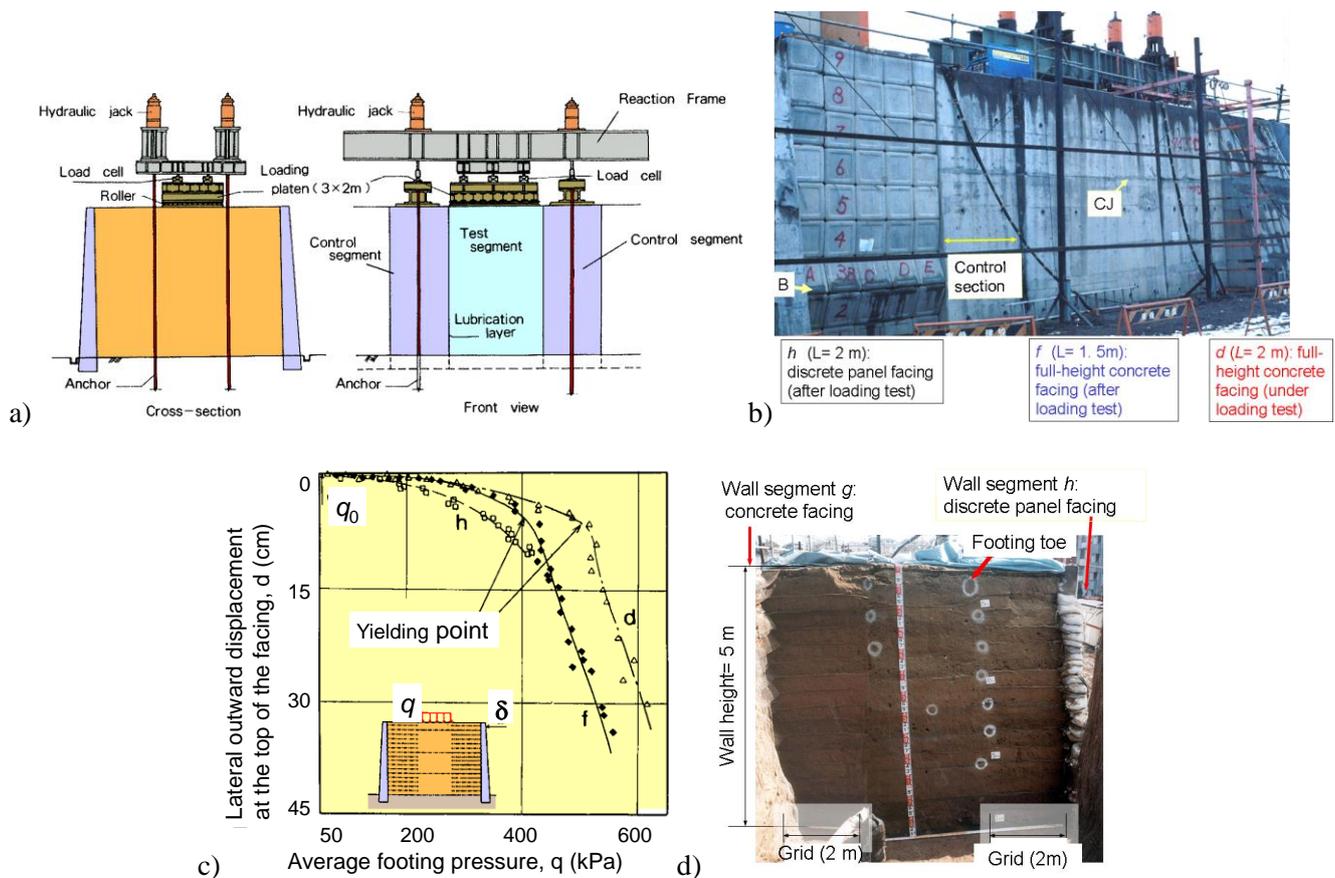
Vertical loading test of JR No. 1 sand embankment (Tatsuoka et al., 1990, 2000, 2008): a) loading method; b) view of wall segments d , f and h after loading test; c) lateral displacement at the facing top vs. footing load relations of wall segments d , f and h (q_0 = average pressure due to the weight of loading apparatus); and d) shear bands observed in segment h (having discrete panel facing).
